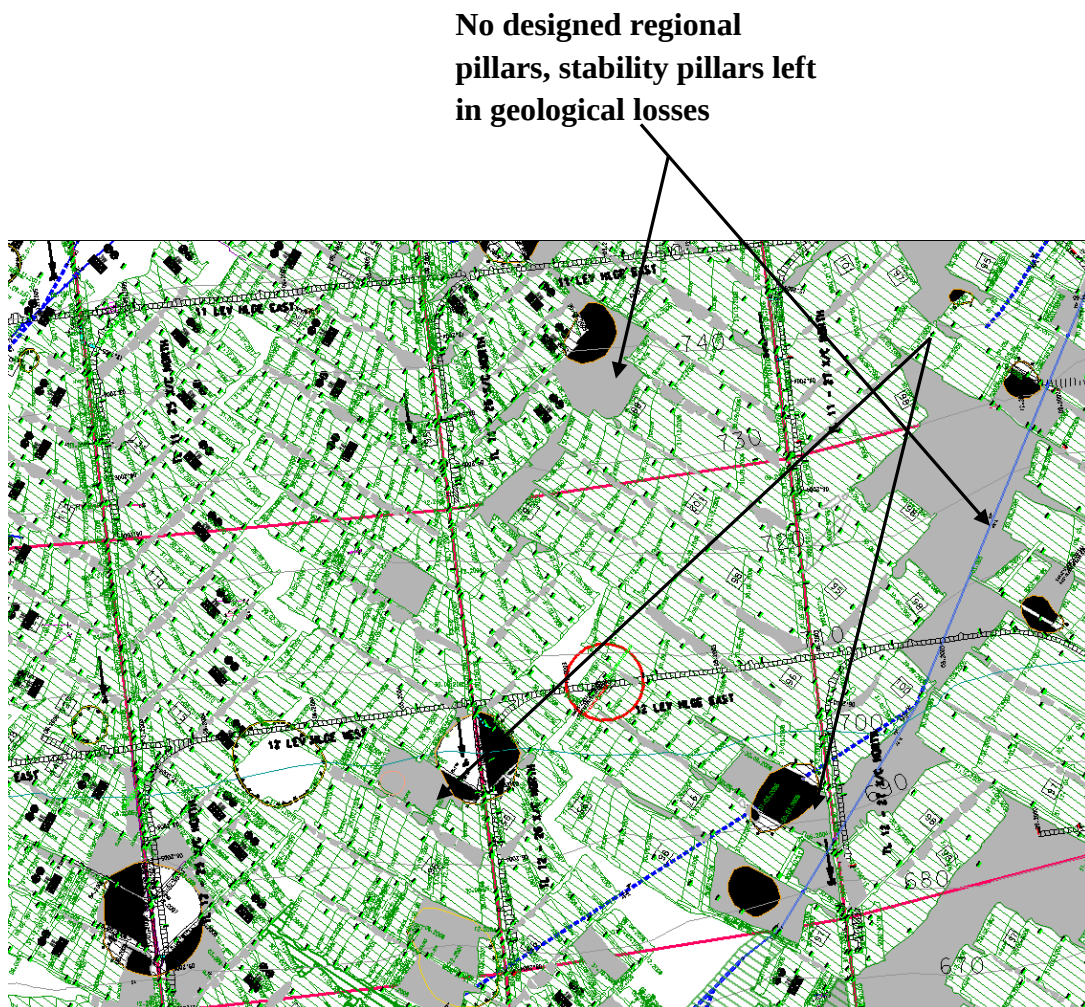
Plan showing a typical mining layout in the UG2 reef horizon at Khuseleka prior to the design of regional pillars
